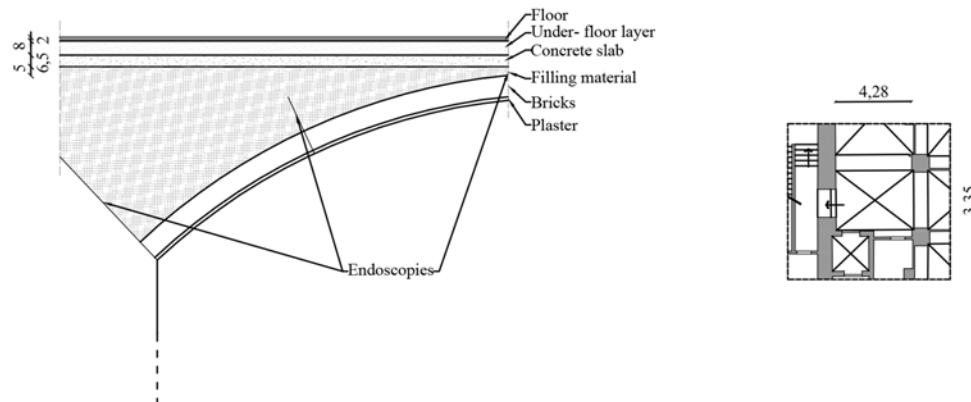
| Examples of structural details surveyed in Palazzo Ducale.
